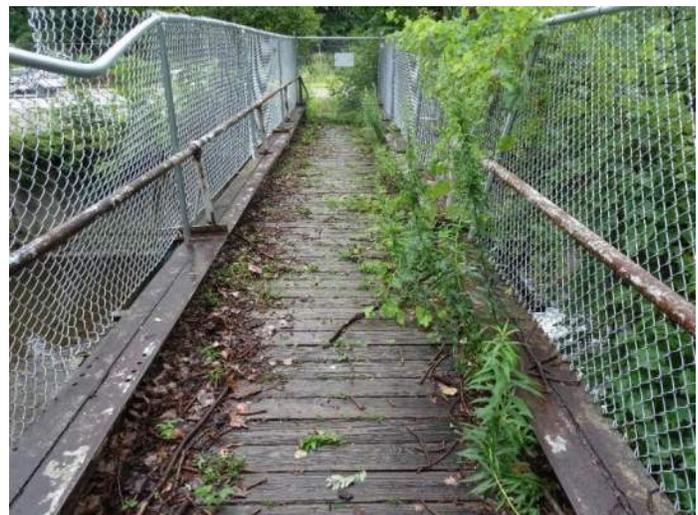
Bell Street pedestrian bridge. Closed with fencing. Photo taken during inspection.
